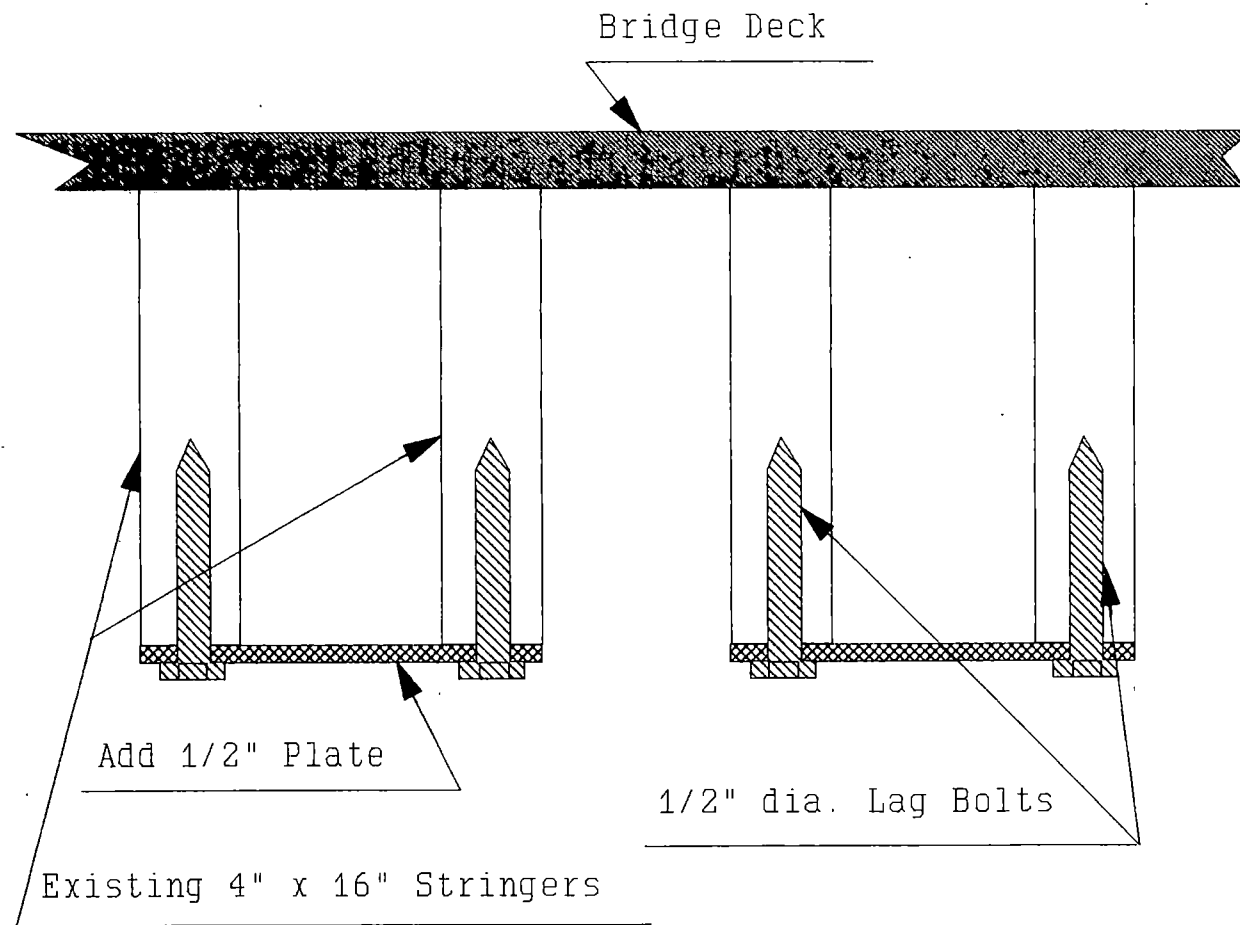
Typical Steel Cover Plate for Timber Stringers
